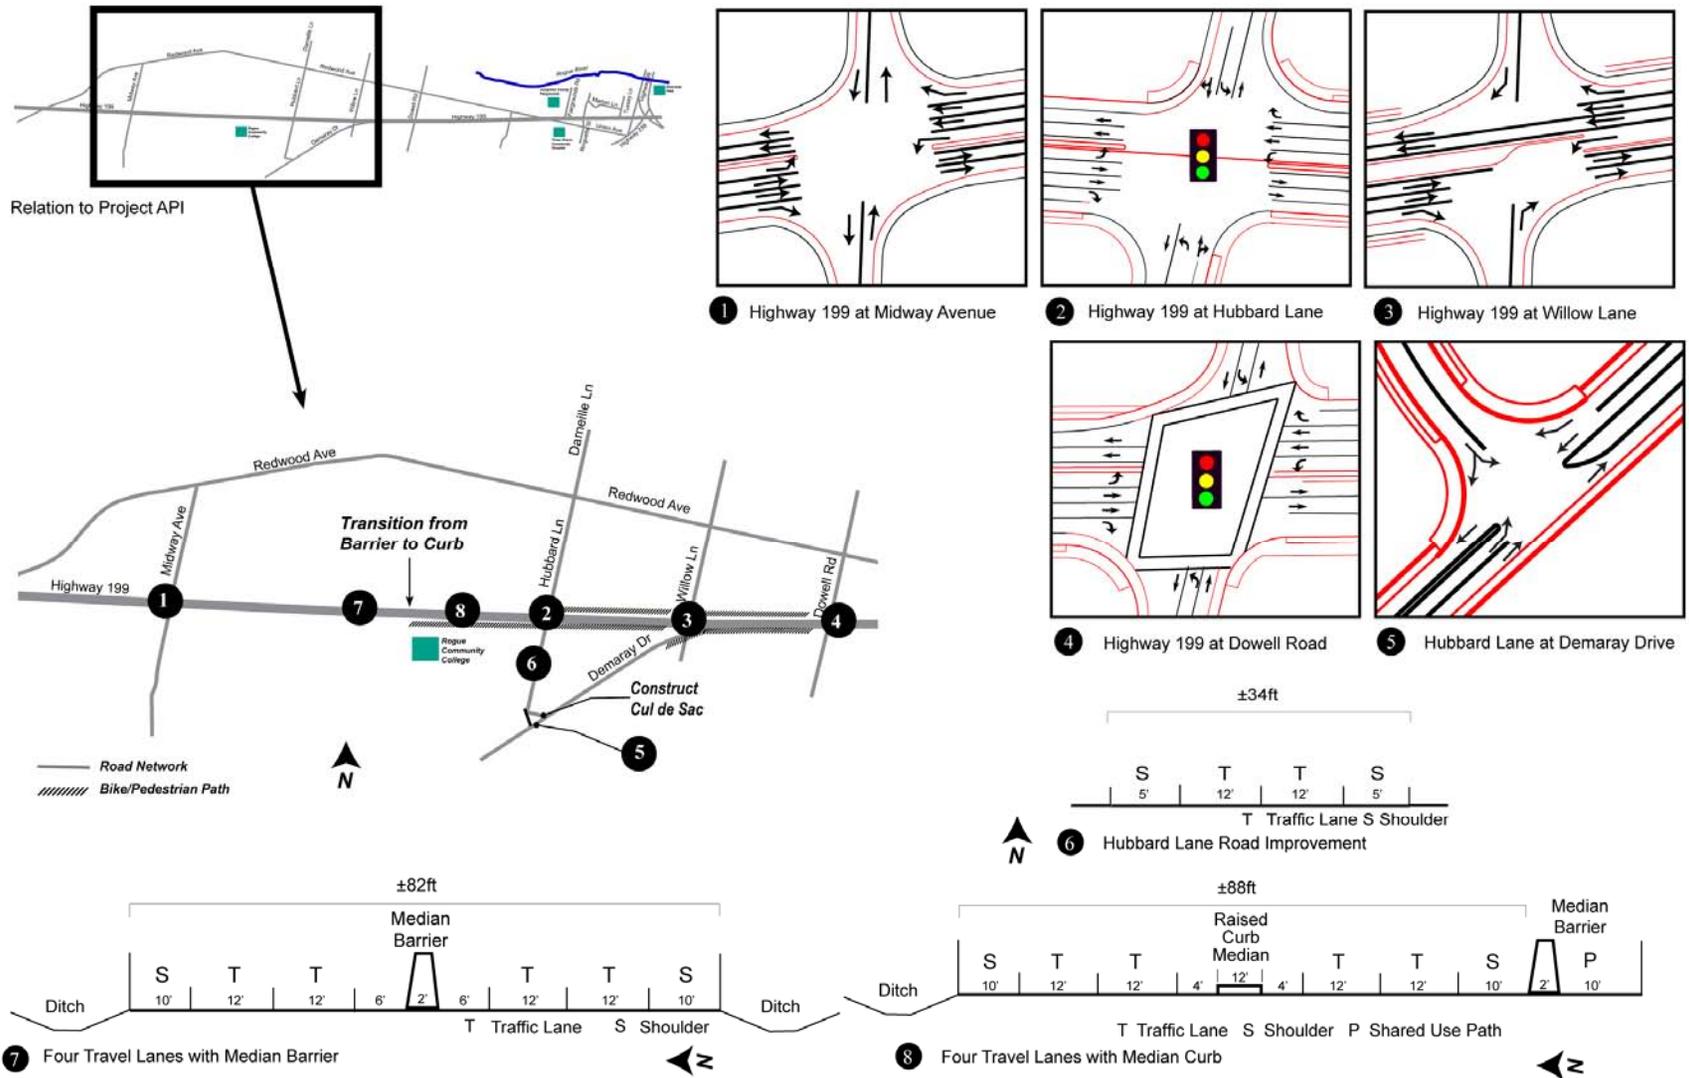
PREFERRED ALTERNATIVE BETWEEN MIDWAY AVENUE AND DOWELL ROAD
